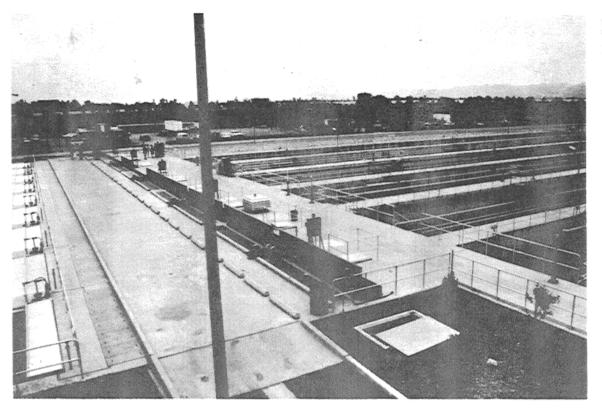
Donald C. Tillman Water Reclamation Plant (view toward northwest from atop plant building, located in northeastern portion of reservoir).
